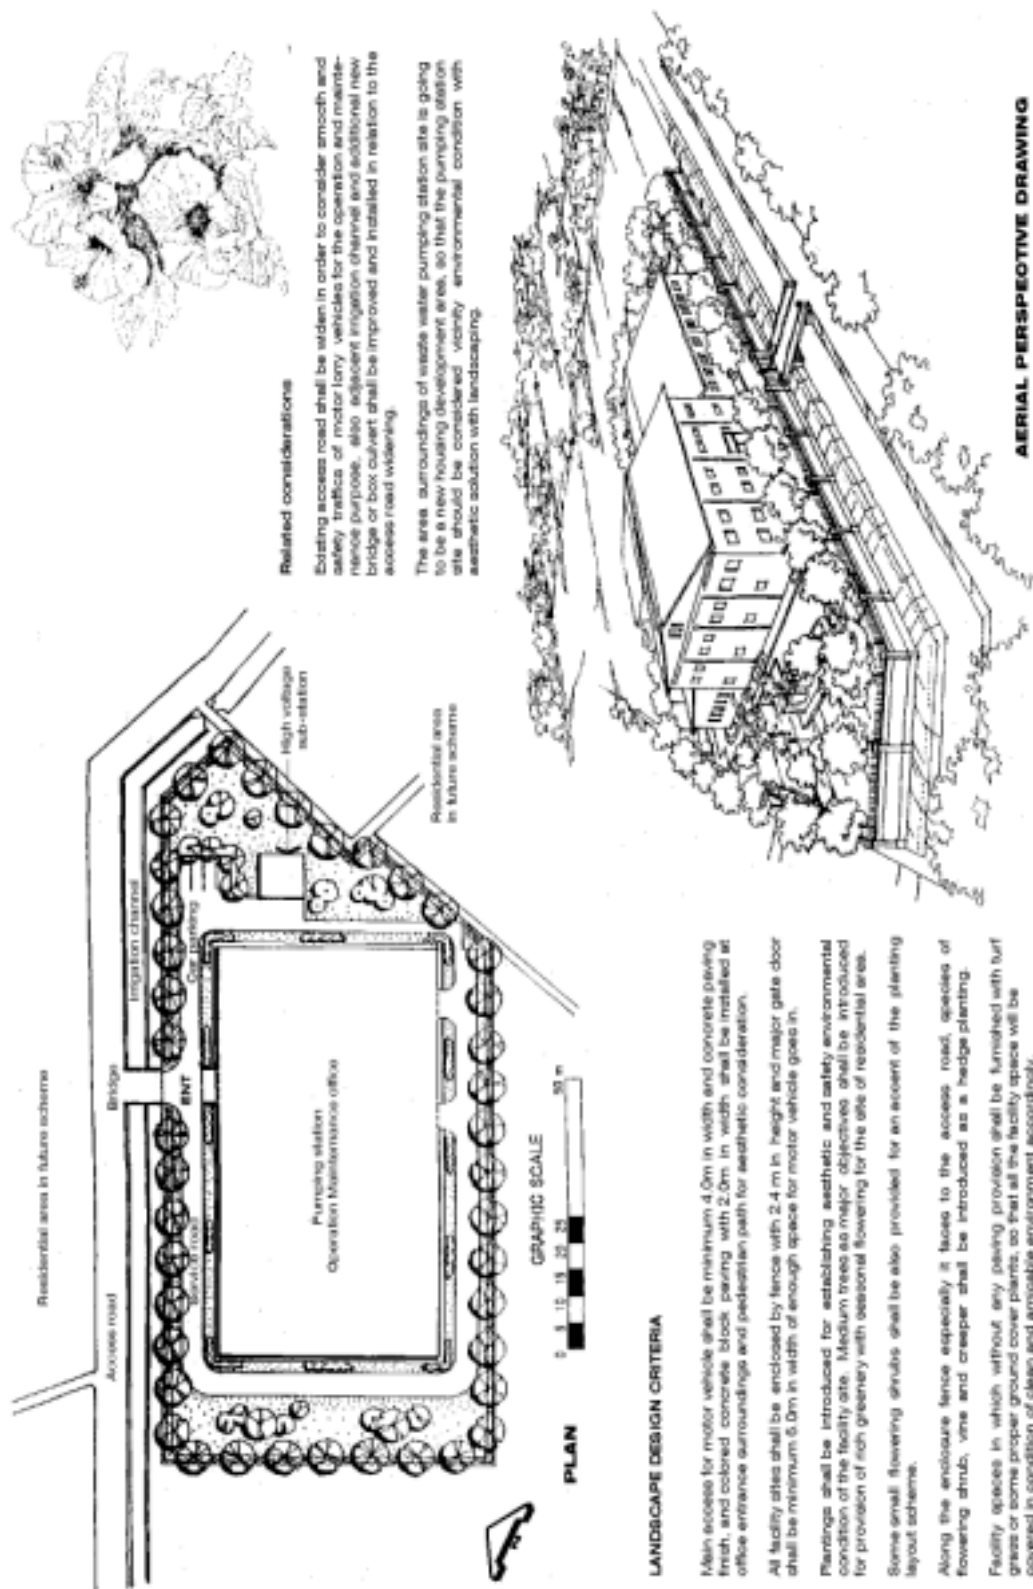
LANDSCAPE PLAN FOR THE INTERMEDIATE WASTEWATER PUMPING STATION SITE
